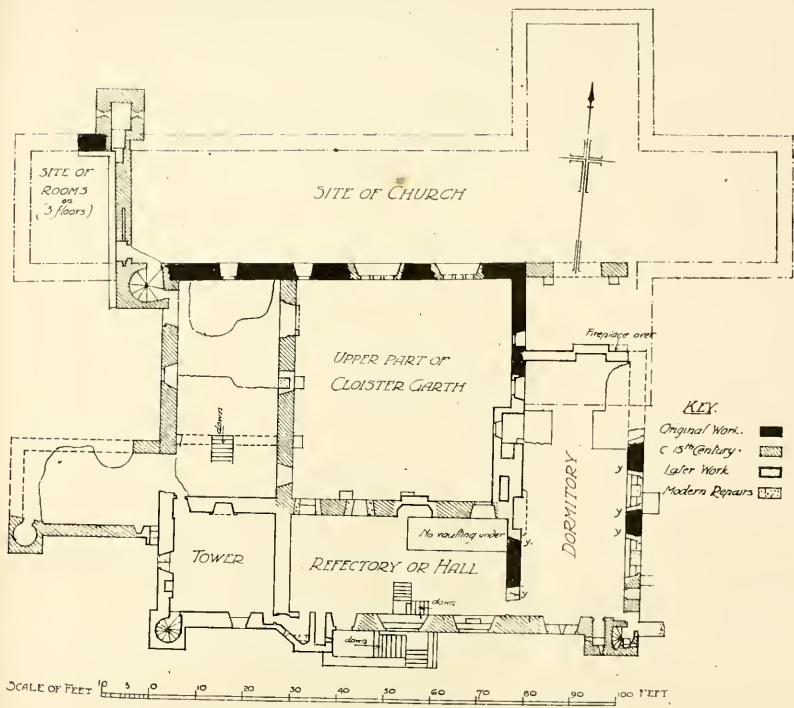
UPPER FLOOR PLAN, BECCITE ABBEY
